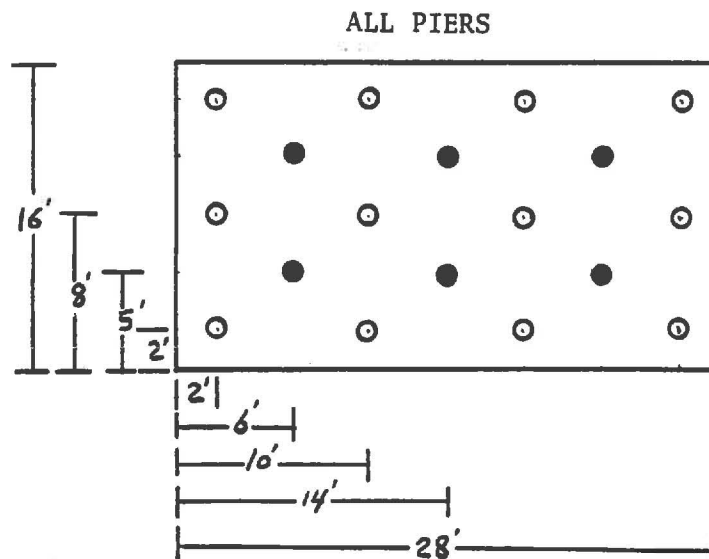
PLAN VIEW OF ONE OF THE BRIDGE PIERS
